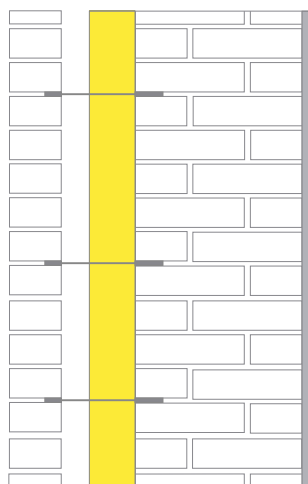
Brick wall with heat insulation and mechanical fixings
